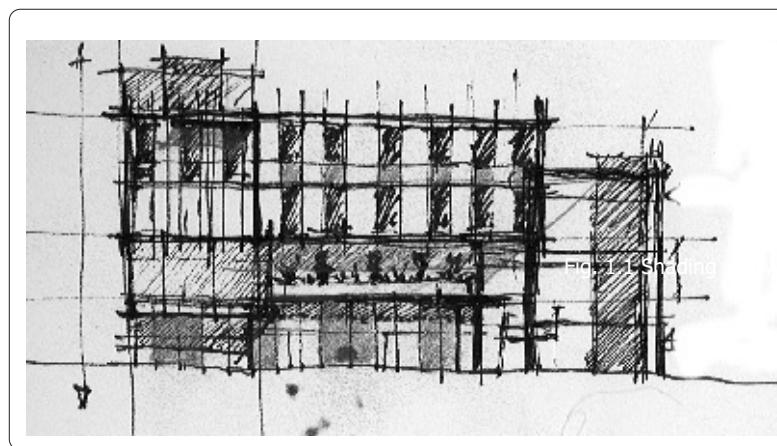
Study of street elevation with floor-to-ceiling glazing
